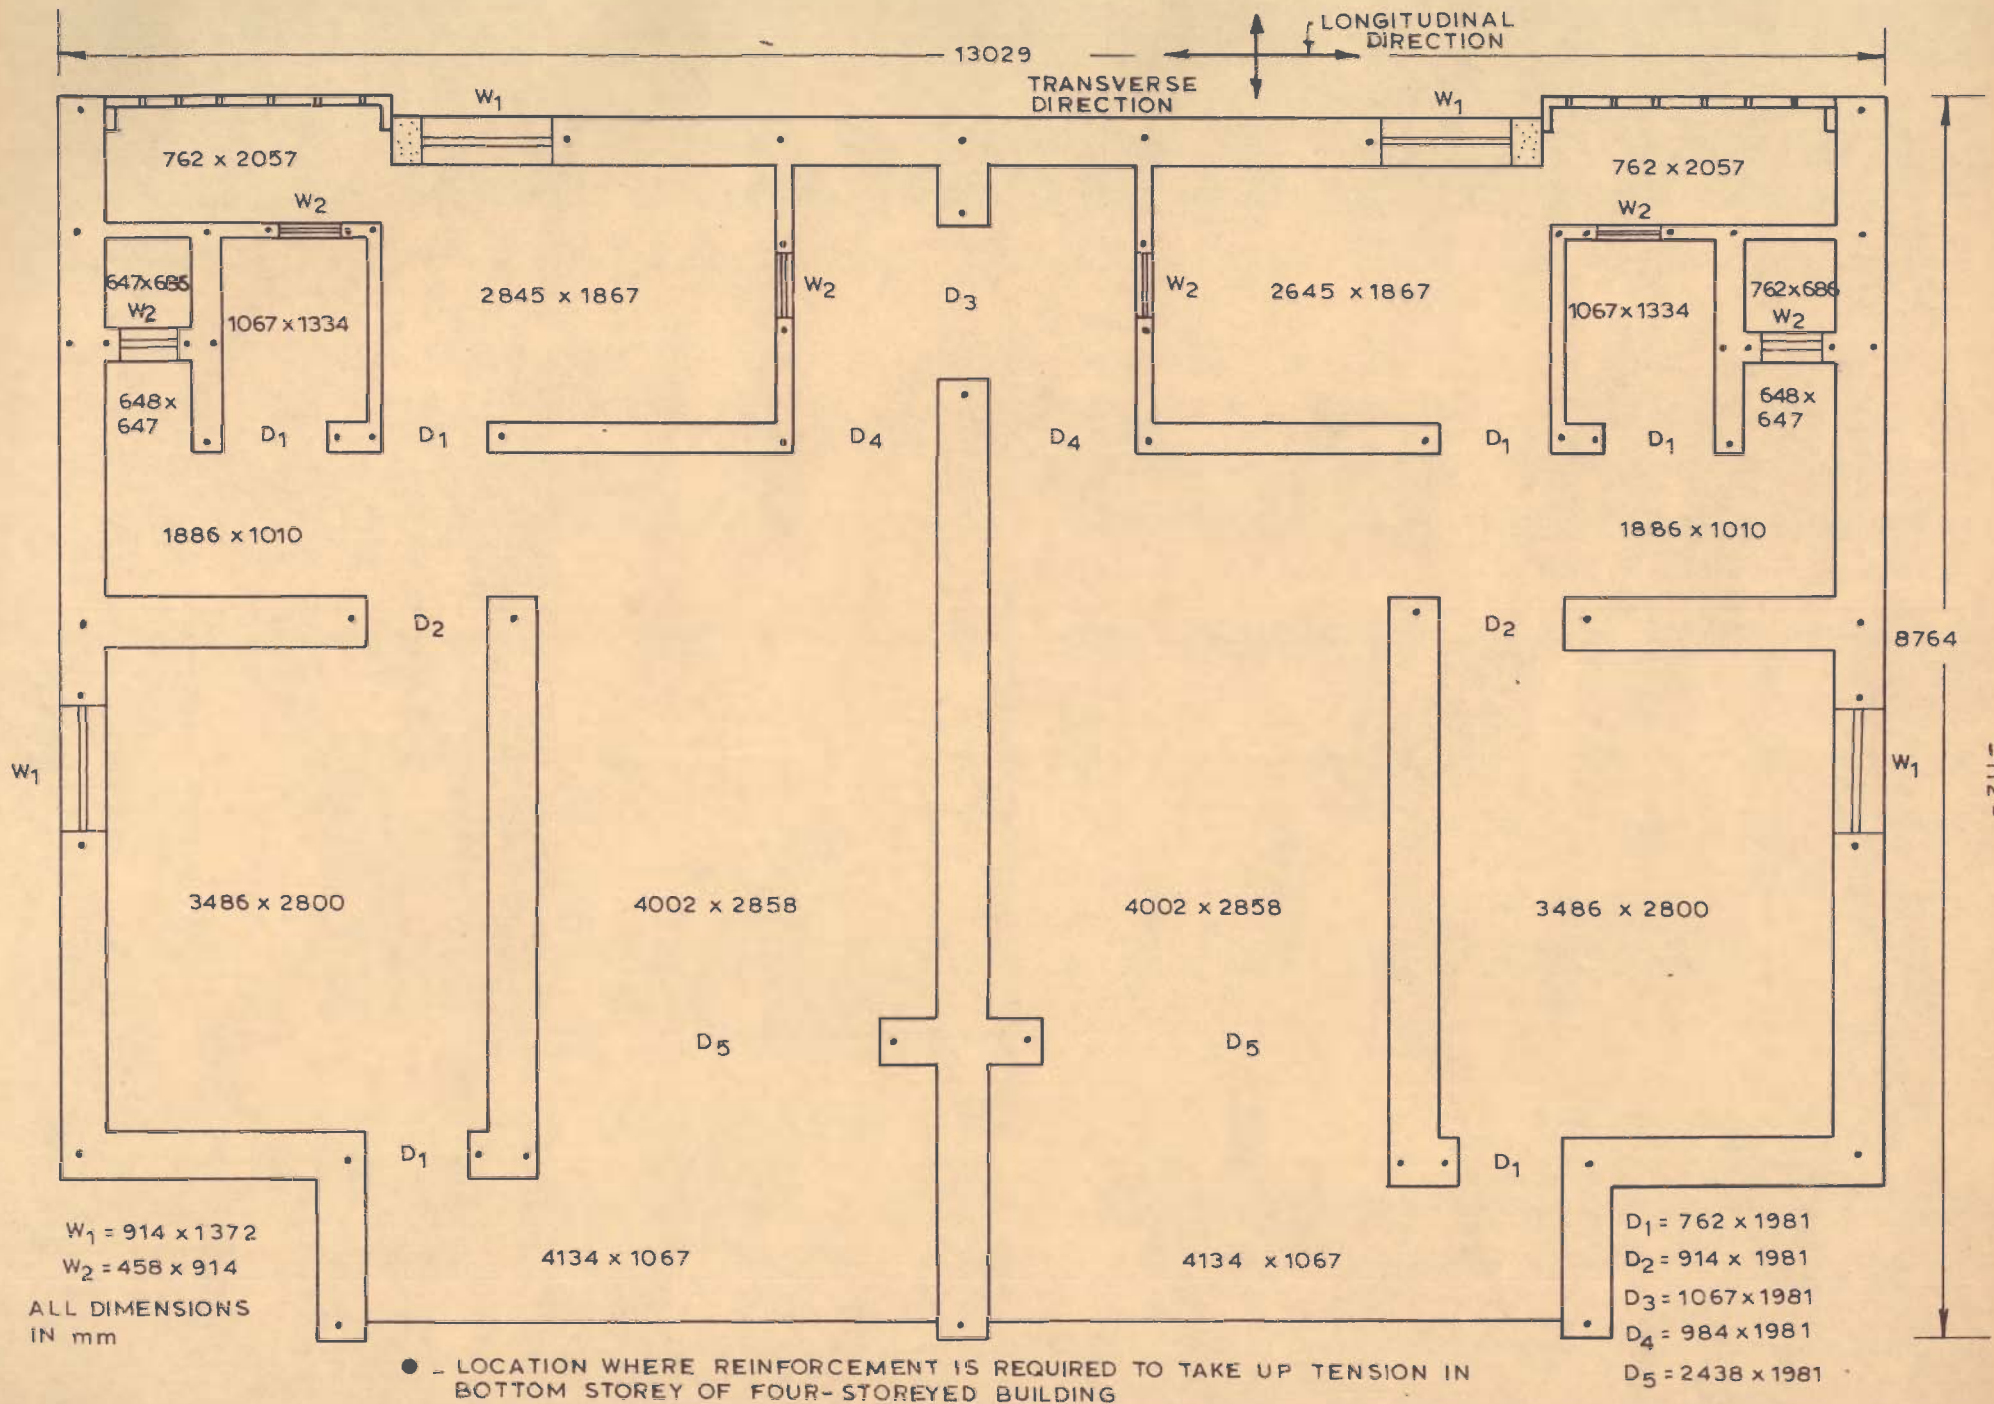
TYPICAL PLAN AT GROUND FLOOR OF A MULTISTOREYED BRICK BUILDING
